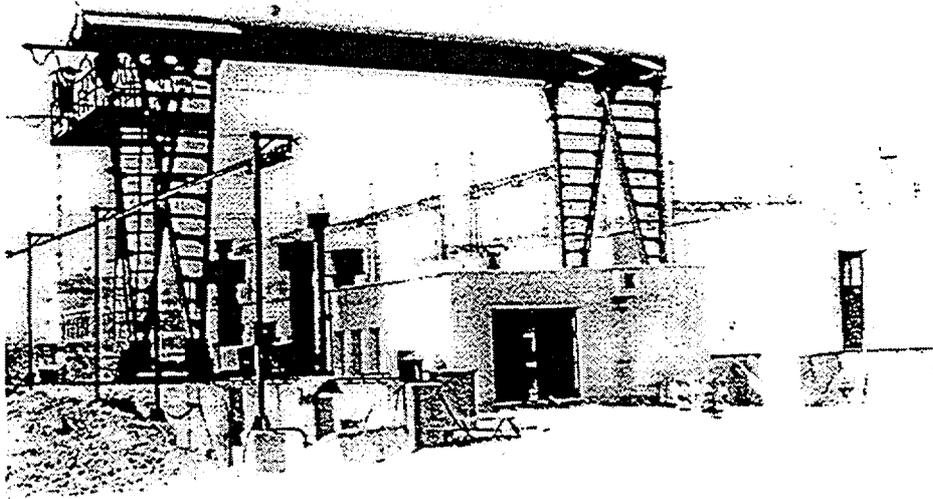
Fire Protection Pump Station 2/FPPS-2/ in Construction
